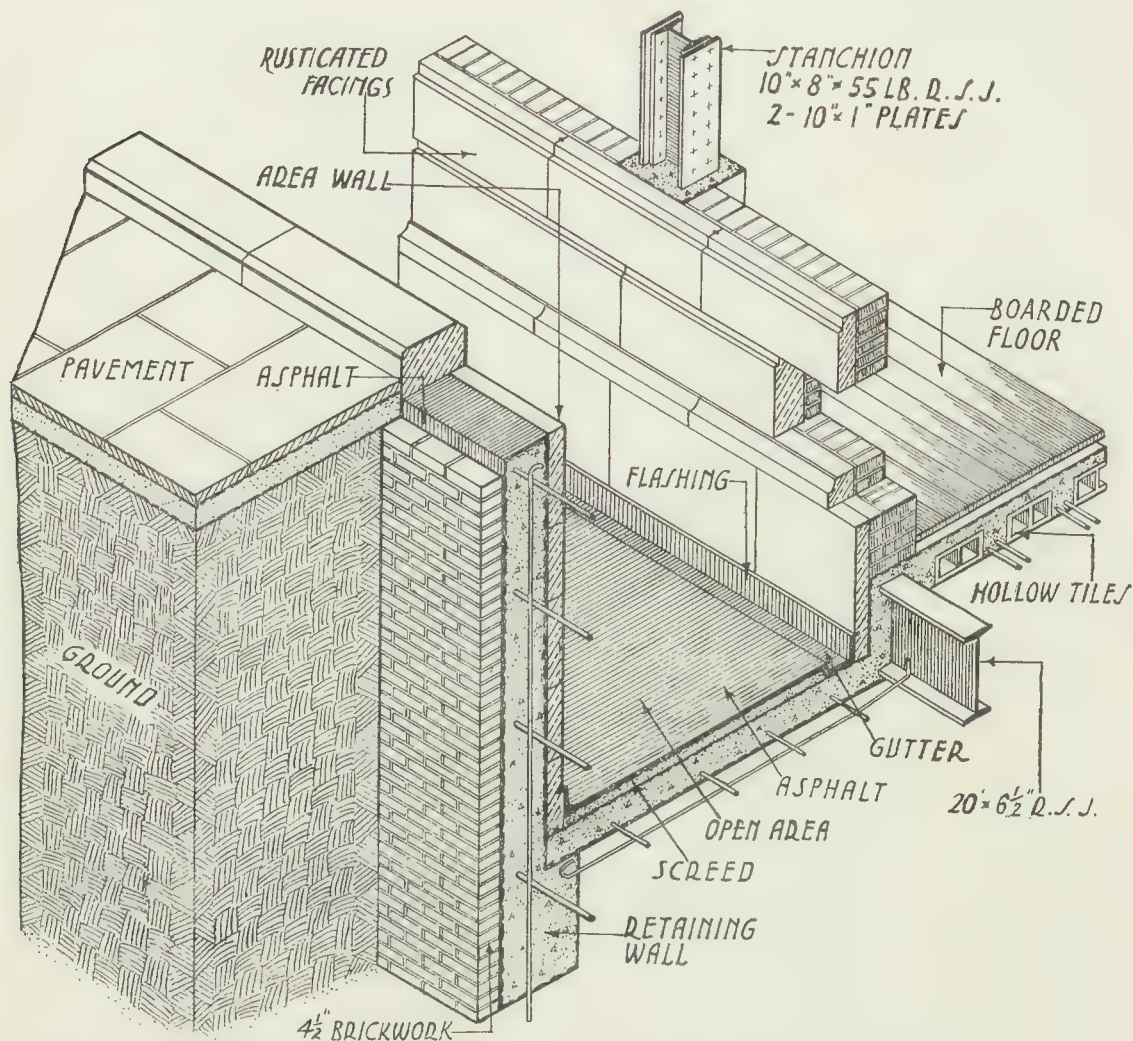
CONSTRUCTION AT BASE OF EXTERNAL WALL, INCLUDING THE CONSTRUCTION OF AN OPEN AREA
